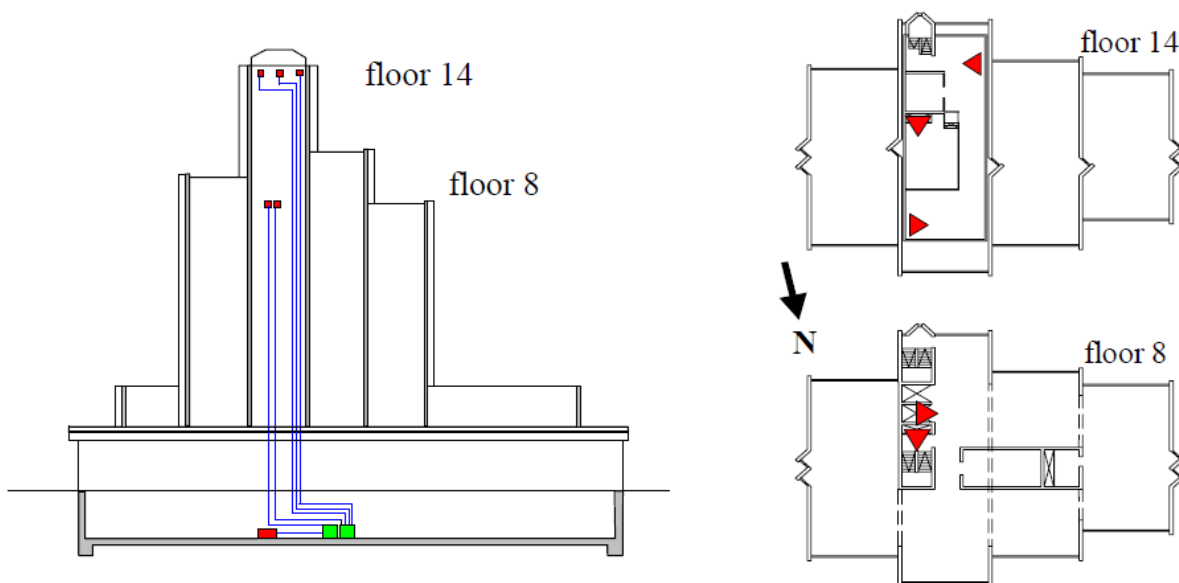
Monitoring system arrangement. Vertical section to the left and floor plans showing the location of sensors (Snæbjörnsson & Sigurbjörnsson, 2006).
